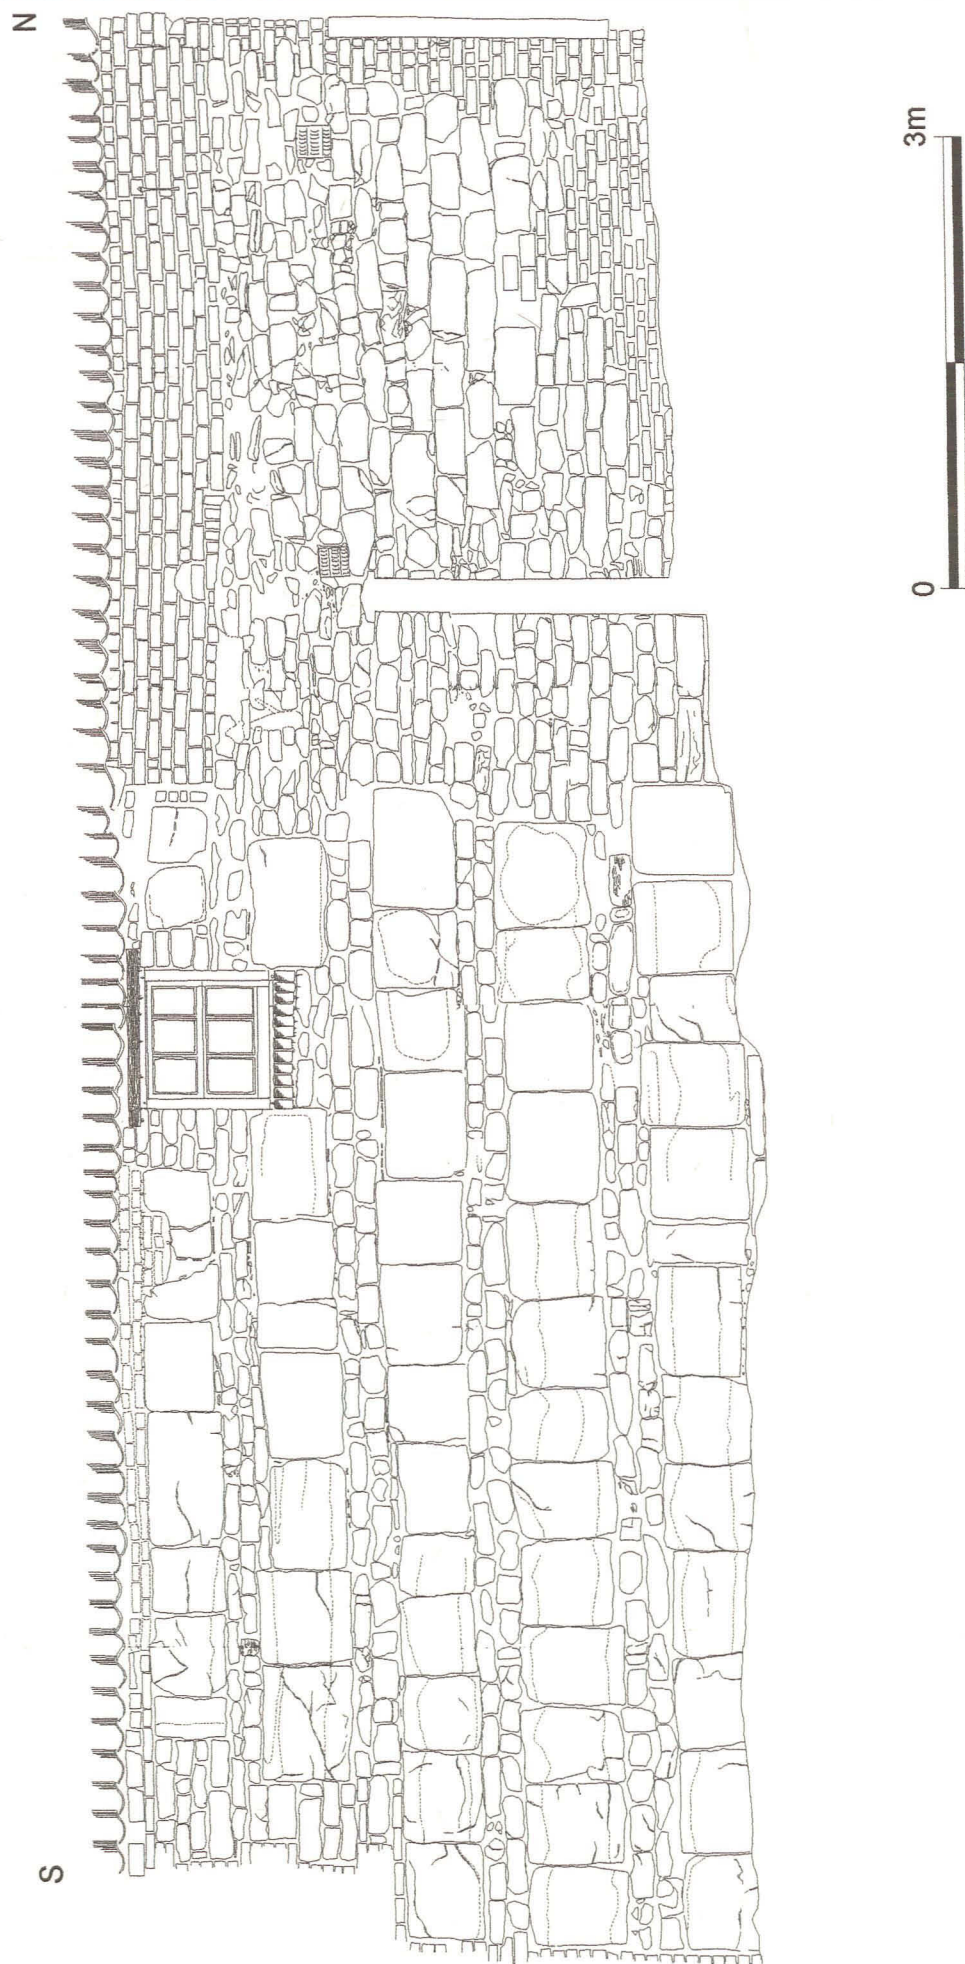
East facing elevation of the Cathedral Close Wall, Pottergate.
